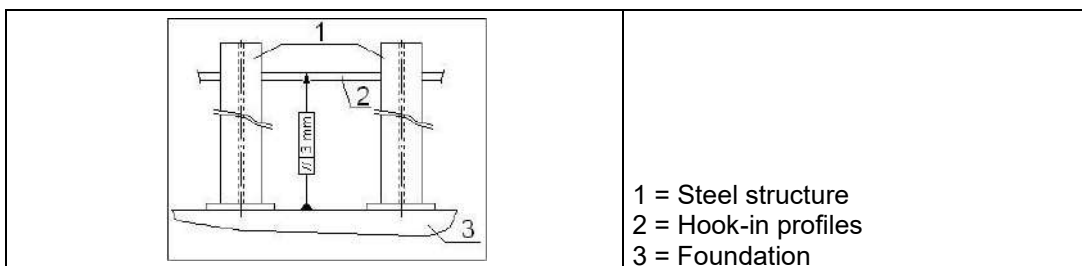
Floor profiles (permitted tolerances)
